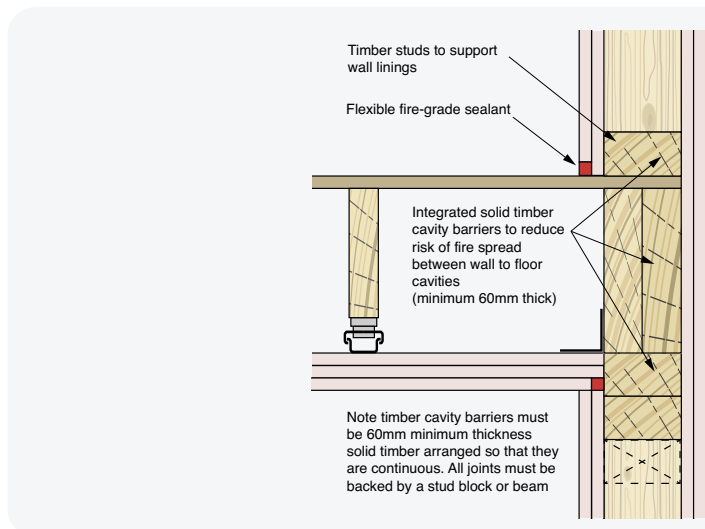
FRL 120/120/120 Fire-protected single stud timber frame wall/floor junction with integral cavity barriers – beams parallel to wall.
